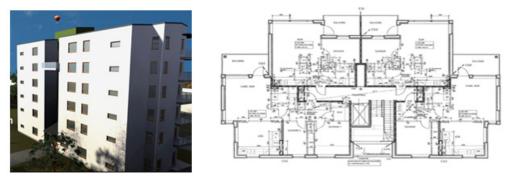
Photograph (left) and ground floor plan (right) of the constructed building in Växjö, southern Sweden.
